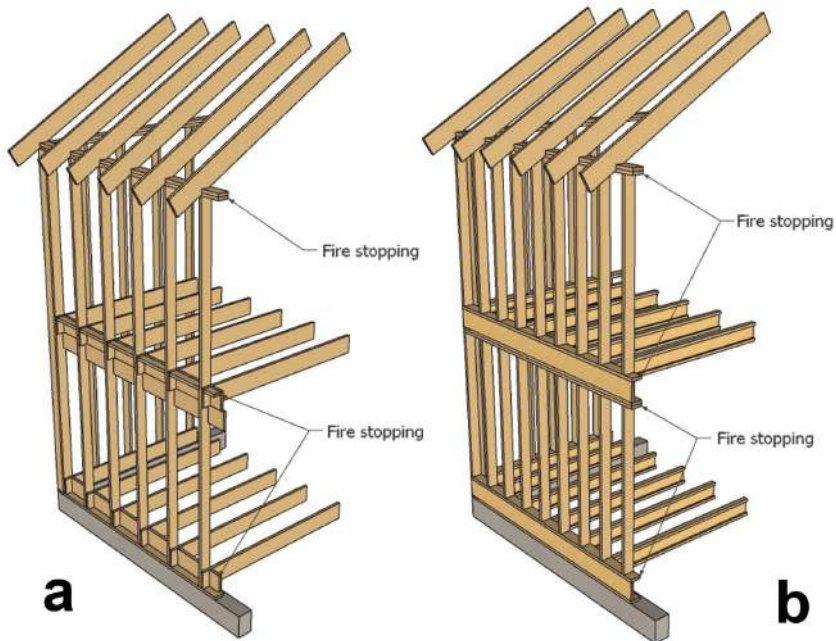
Light timber frame construction: (a) Balloon-framing, (b) Platform-framing.
